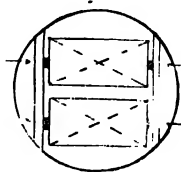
Arrangement of Wood Guides when Cage carries Two on a Deck
